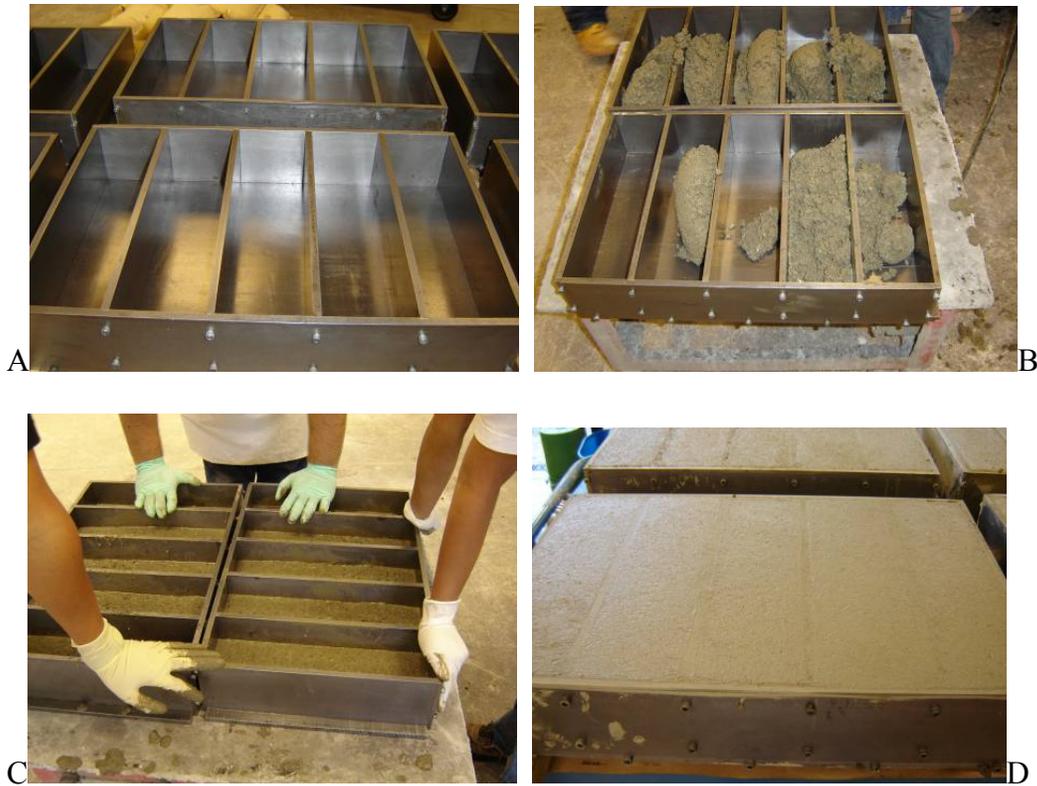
Casting concrete beams. A) steel forms B) first lift of concrete in forms C) consolidation of concrete with vibrating table D) finished concrete in the forms.
